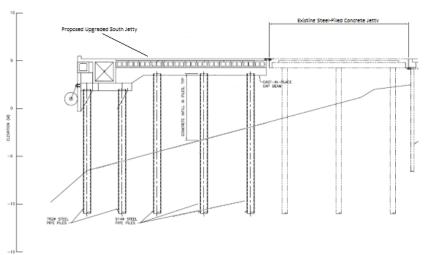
Schematic Section of Esquimalt Graving Dock South Jetty Showing Existing Concrete Jetty and Proposed Upgraded South Jetty (Replacing Existing South Timber Jetty)
